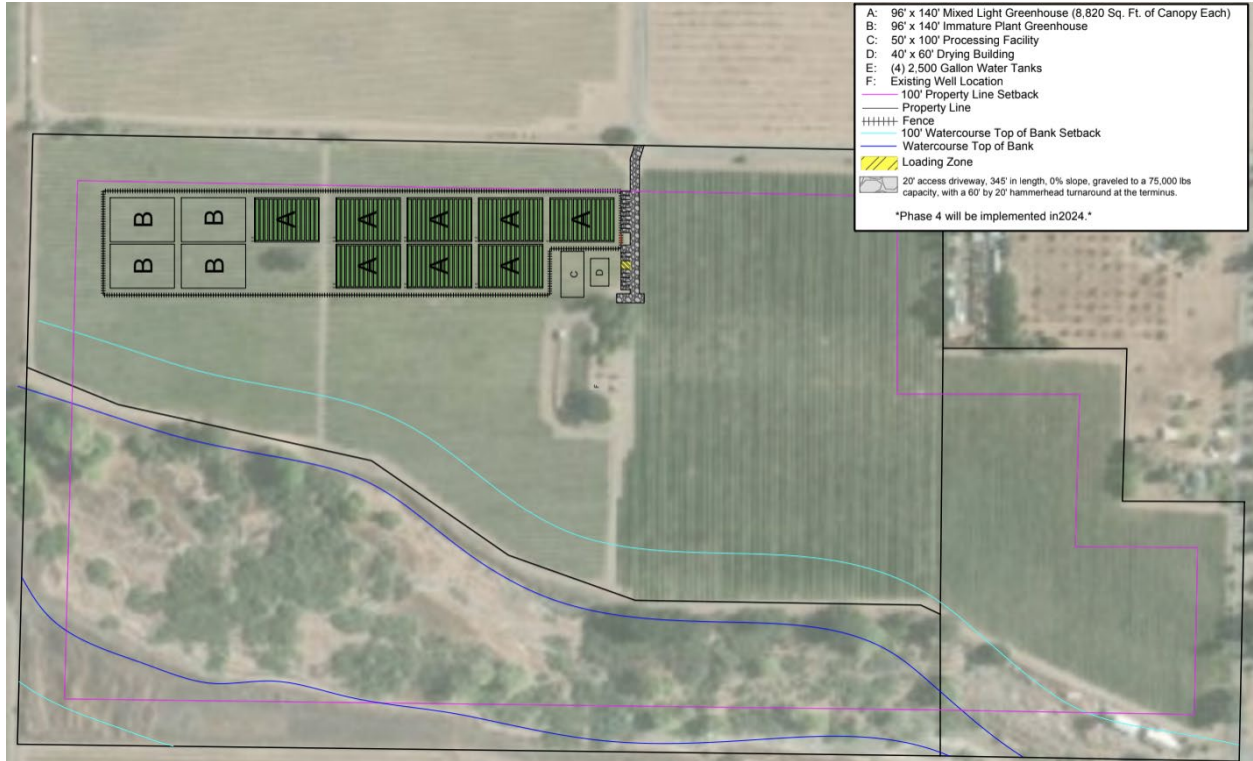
Proposed Project Site Plan (Source: North Coast Select Site Plans)
